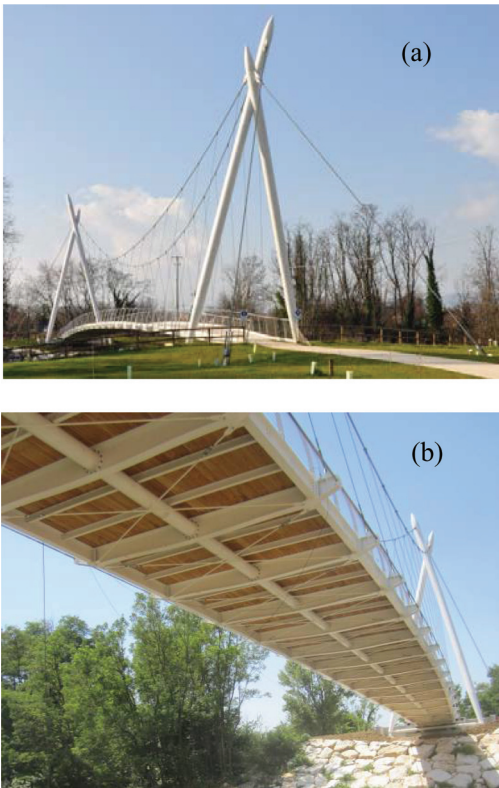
Seriate Footbridge: (a) overall view; (b) footbridge deck, detail of longitudinal and transverse beam.
